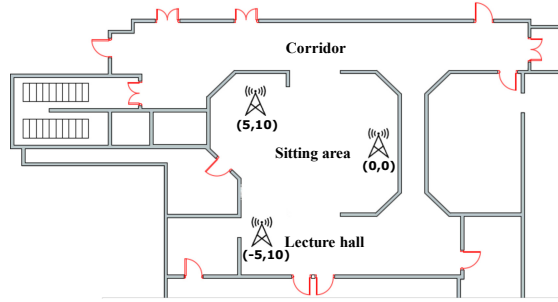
Floor plan of Benson Center basement at Santa Clara University, Santa Clara, USA
